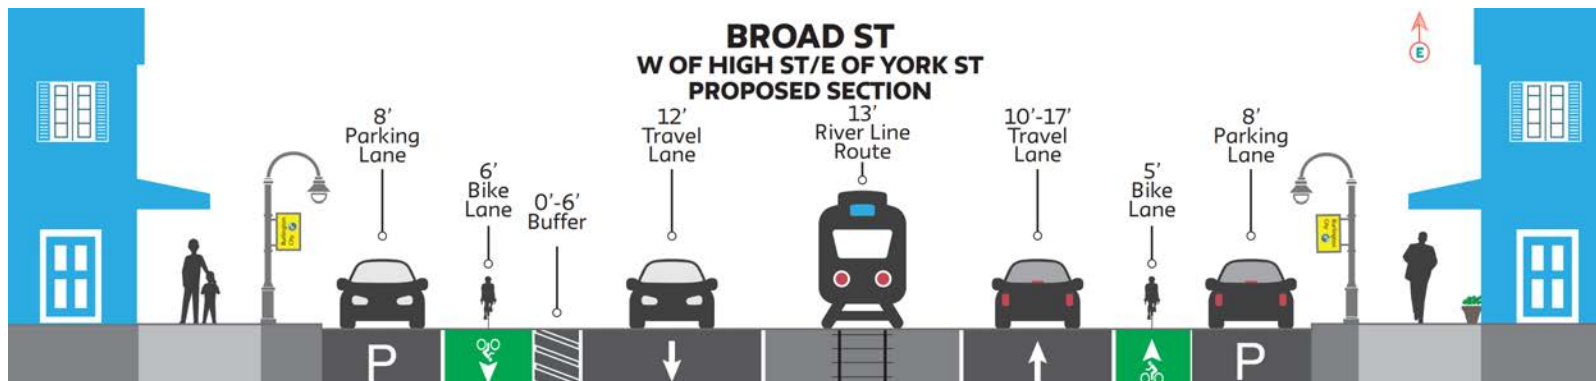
Proposed Cross Section Broad Street - West of High Street/East of York Street
